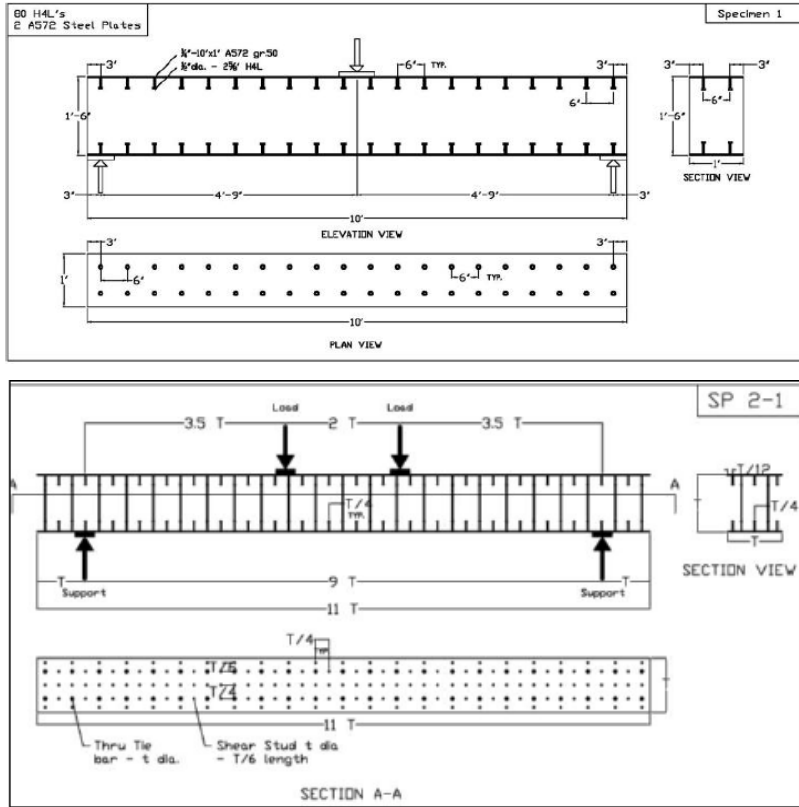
Tested Specimen with and without Shear Reinforcement, Varma et al. (2011)
